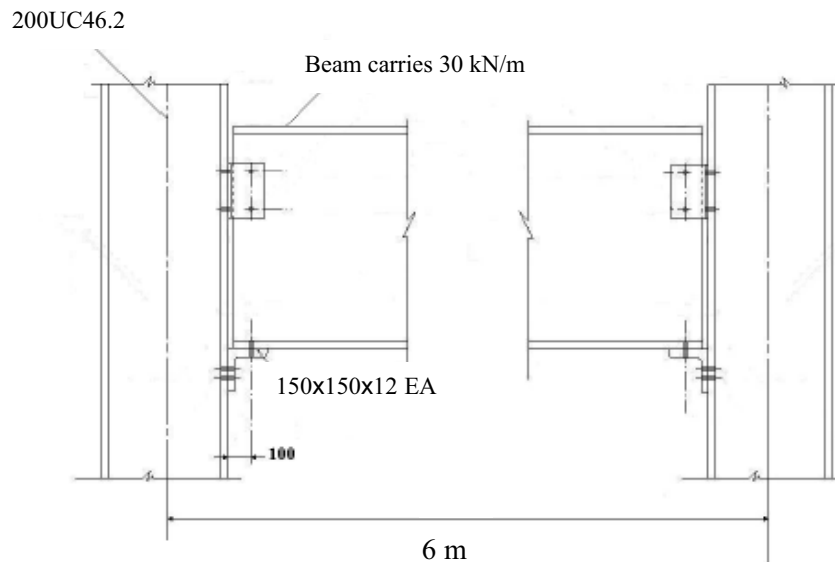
(e) *A typical Beam-Column Connection showing Eccentricity of Load on Column
